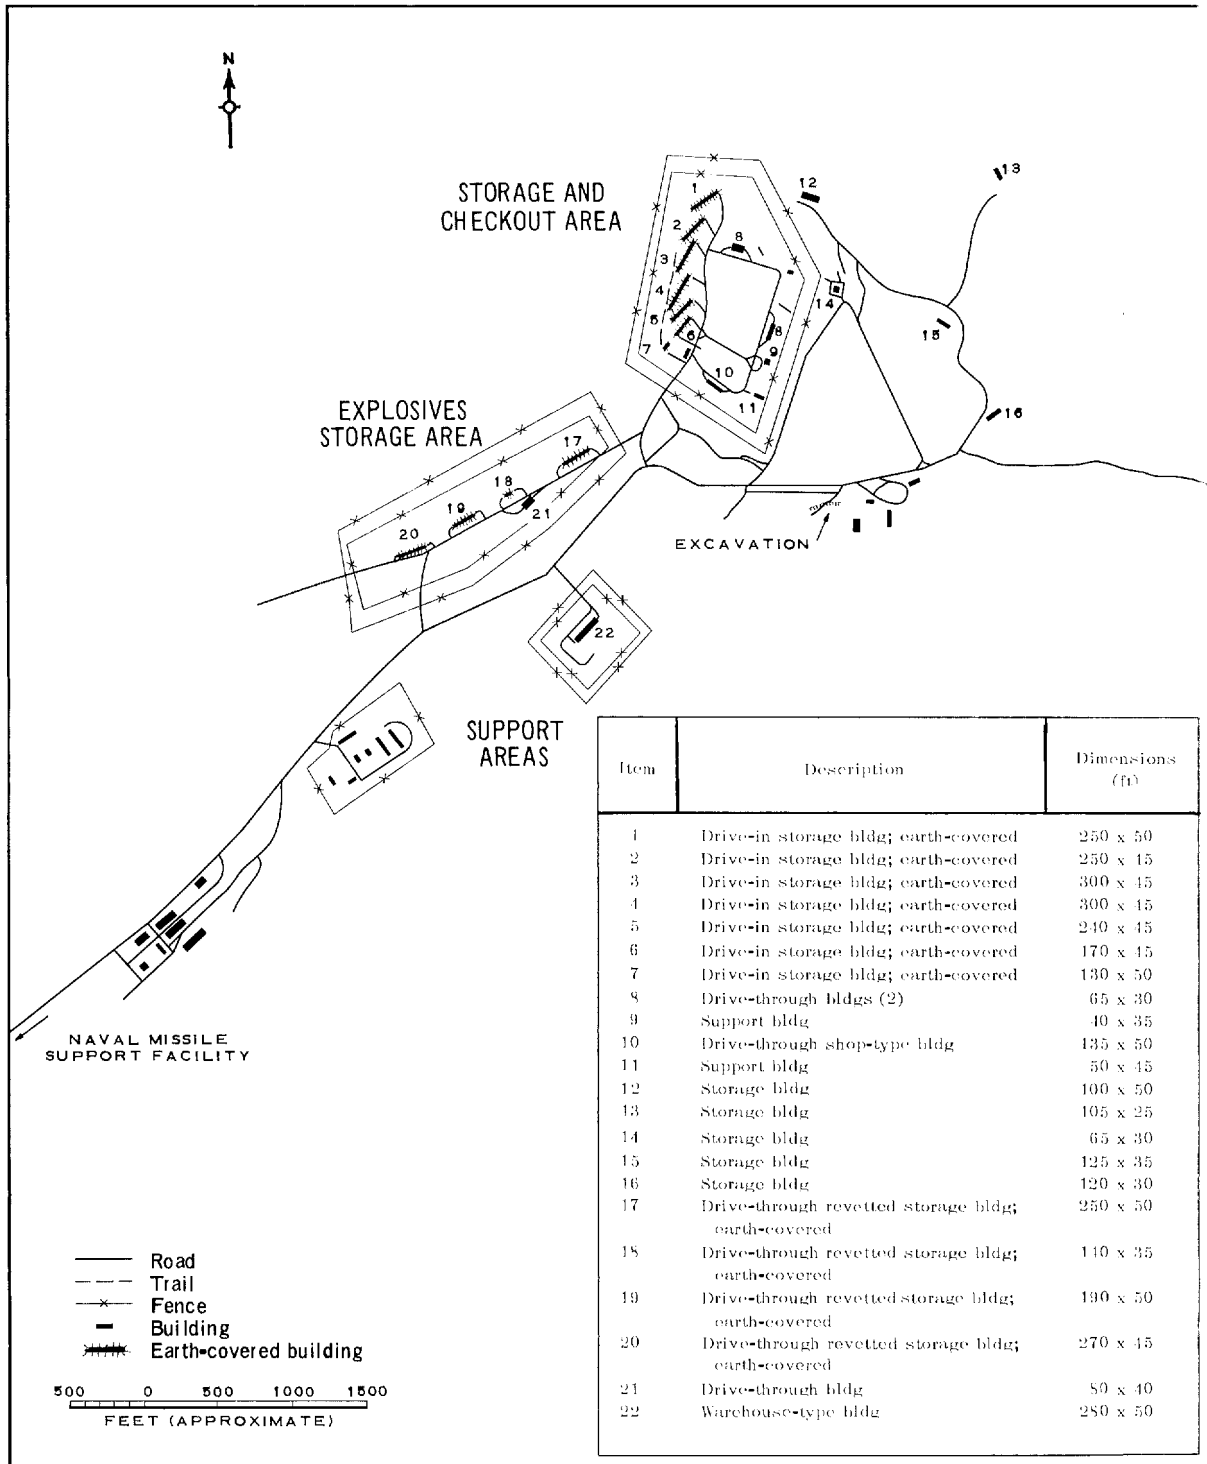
LAYOUT OF NAVAL MISSILE STORAGE FACILITY.
